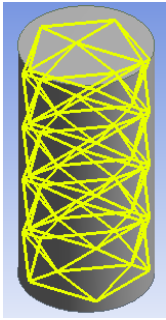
GFRP-pentagonal isotruss confined concrete column
